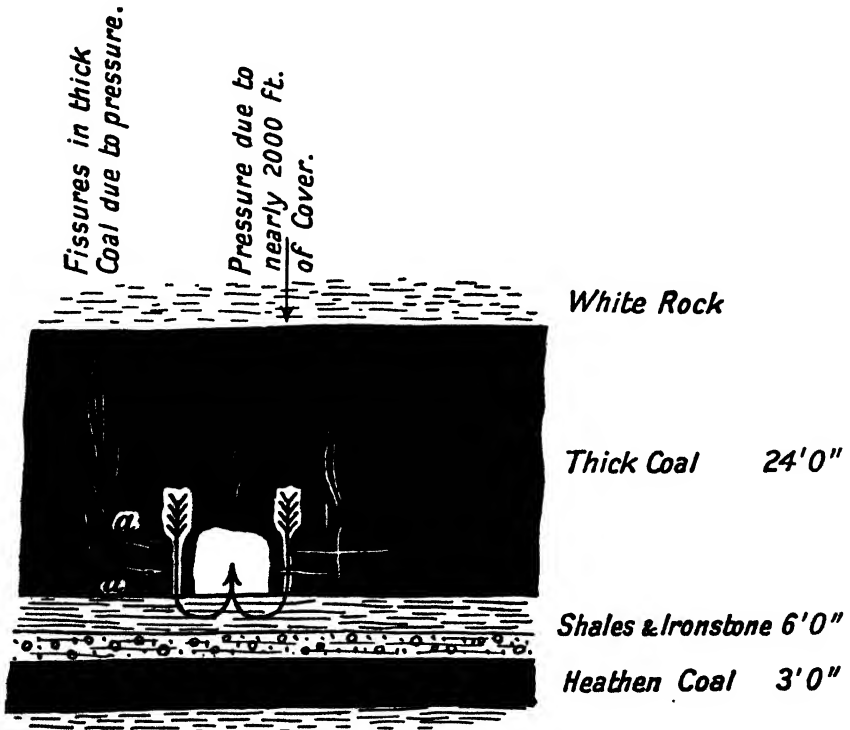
DIAGRAM ILLUSTRATING PRESSURE ON FLOOR BY ROADS DRIVEN IN THICK COAL. Arrows denote direction of pressure on bottom or floor. *a, a* denote side or horizontal fissures connecting with main or vertical fissures.
